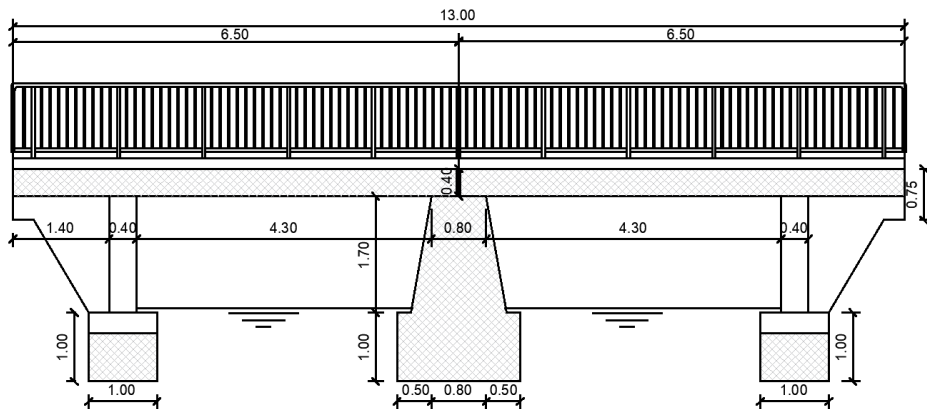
Longitudinal section of the repaired bridge - the second alternative solution
